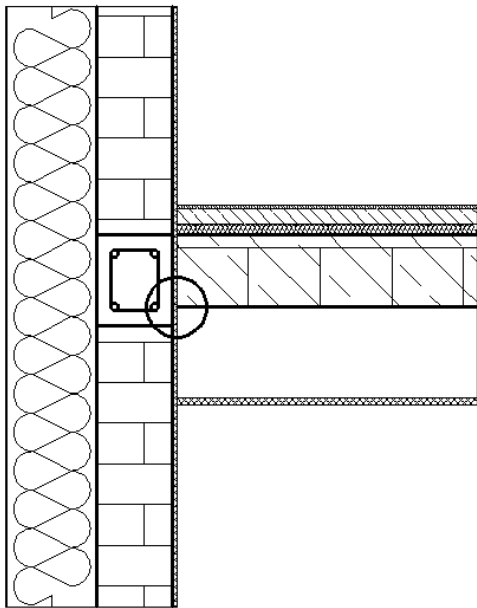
Location of the Thermal bridge in the connection of the exterior wall with the concrete beam. [66]
